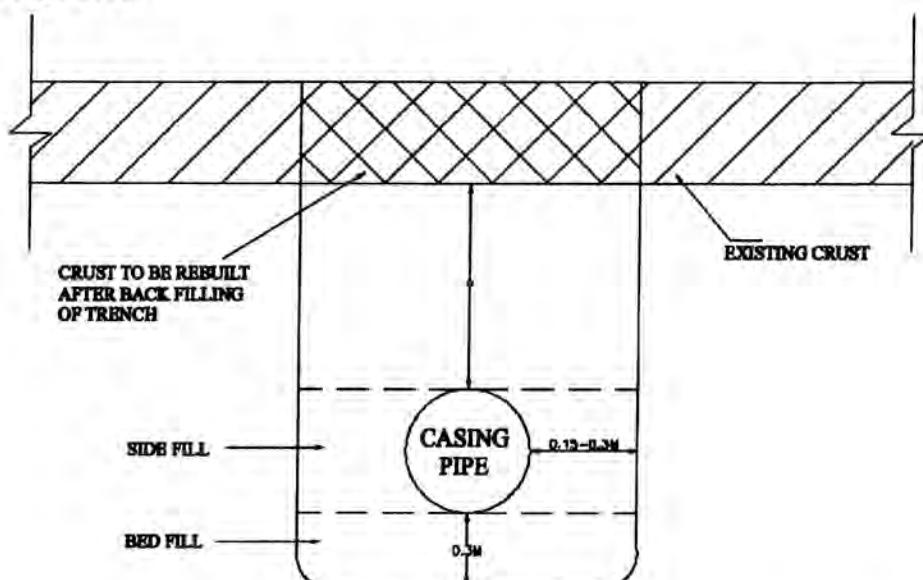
Typical Cross-Section of Crossing a Road Through Casing Pipe
